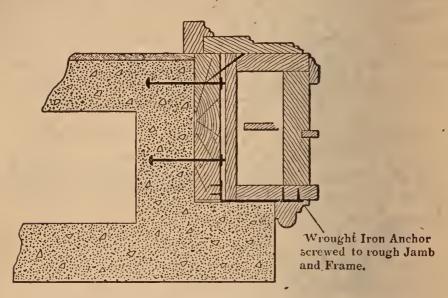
Method of Fastening Window Frames in Concrete Construction.
